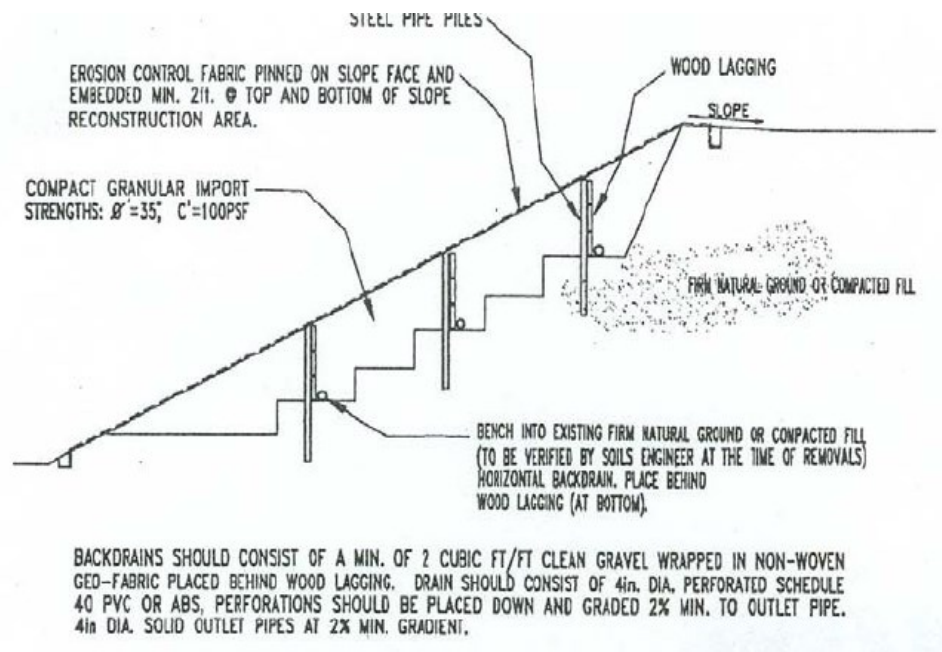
Pipe pile and wood lagging repair (Day, 1997)
